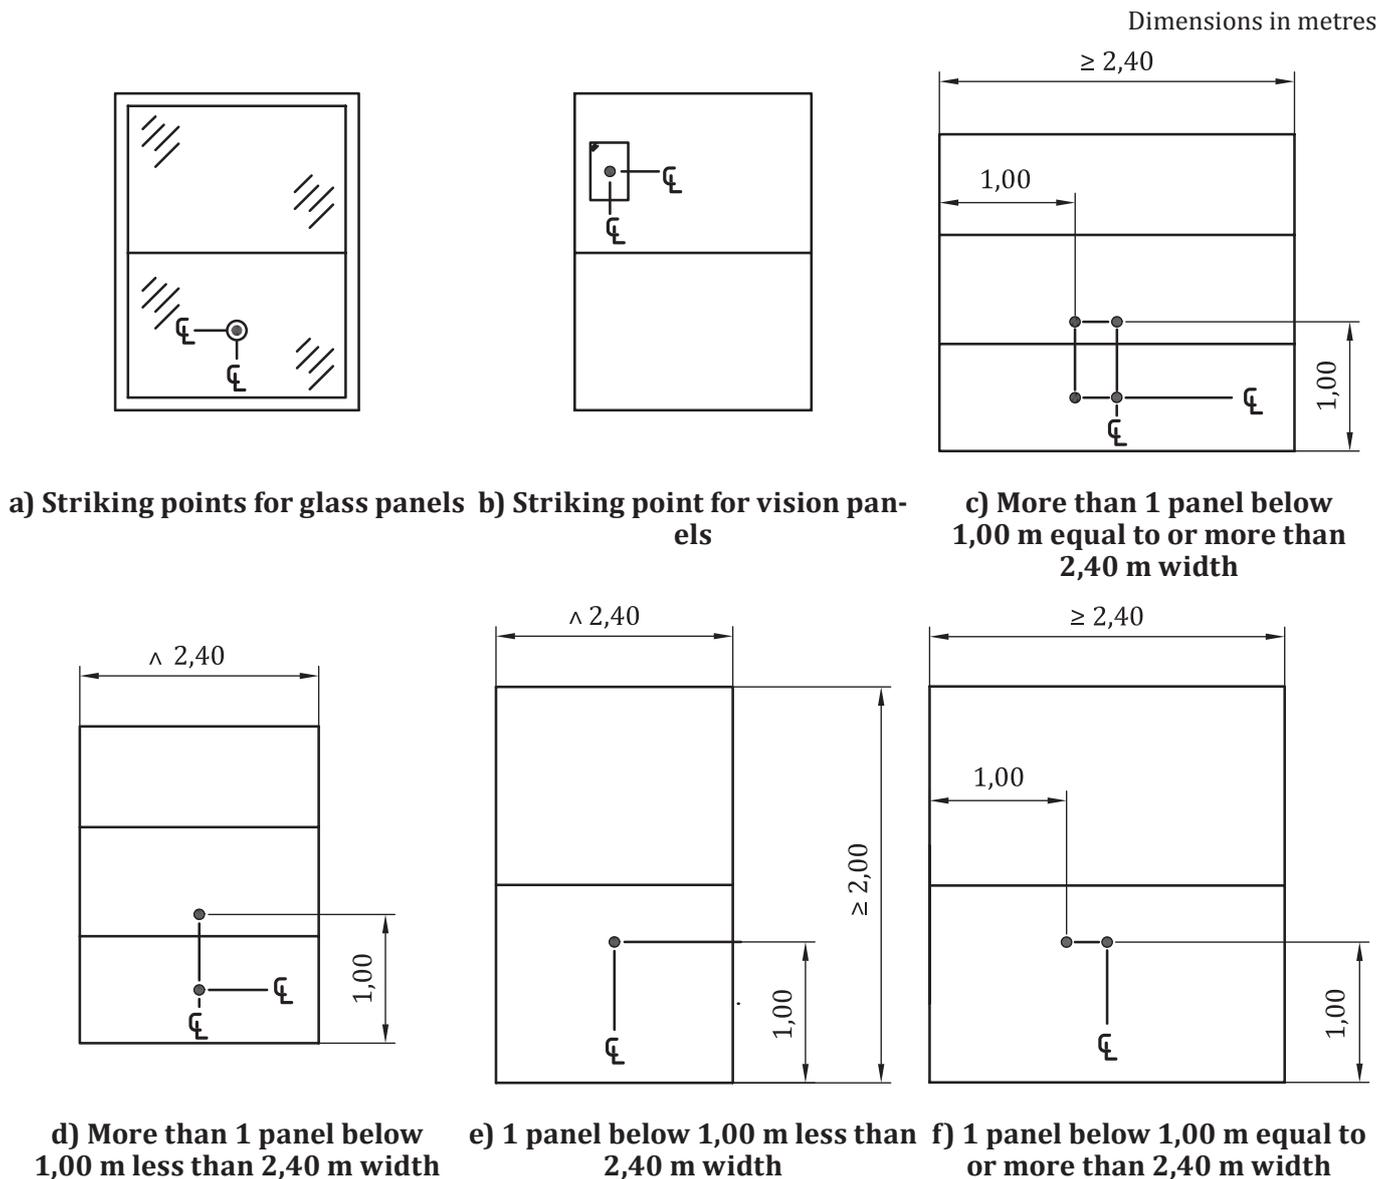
Horizontal door panels — Pendulum shock tests — Striking points
